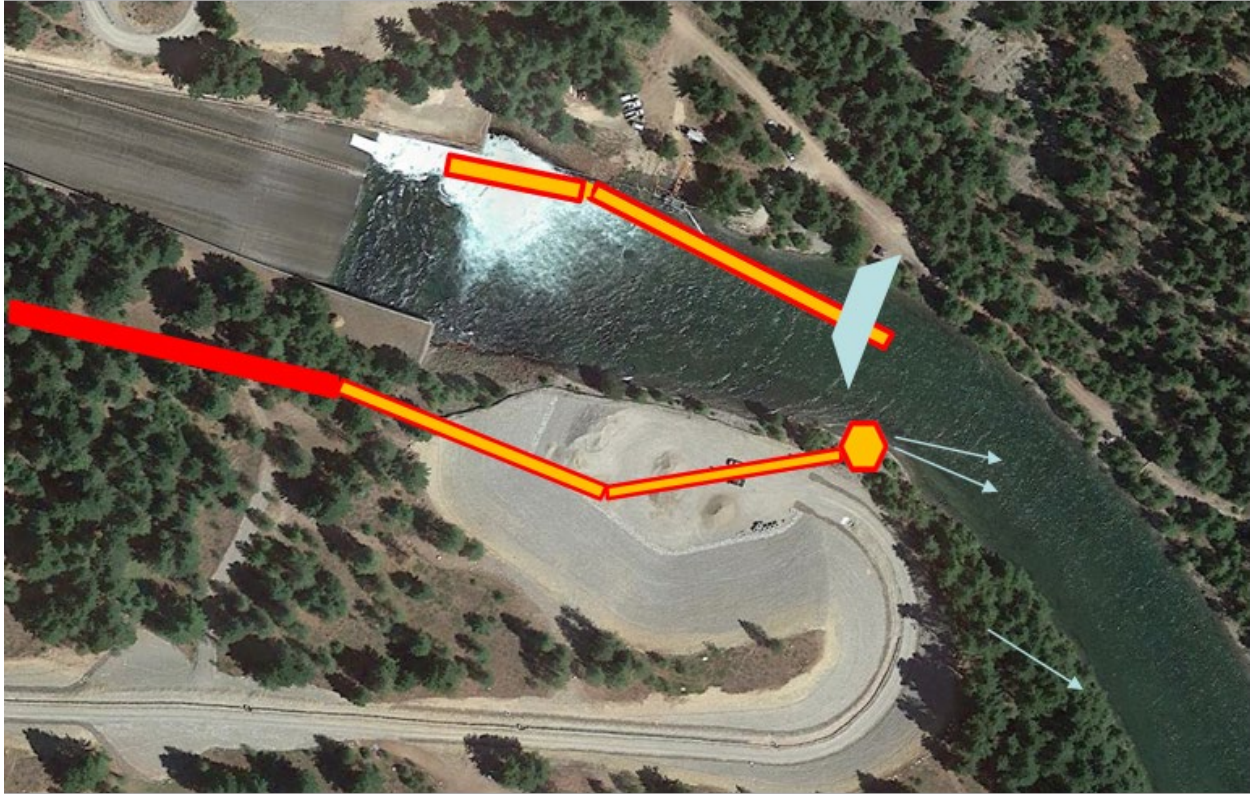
Outlet Works Diversion Conduit extends downstream from the dam outlet along the left (north) bank of the river, but has not yet been connected to the dam outlet. Approximately three-quarters of the cofferdam (gray) is shown extending across the conduit (Reclamation 2020, their Figure 15).
